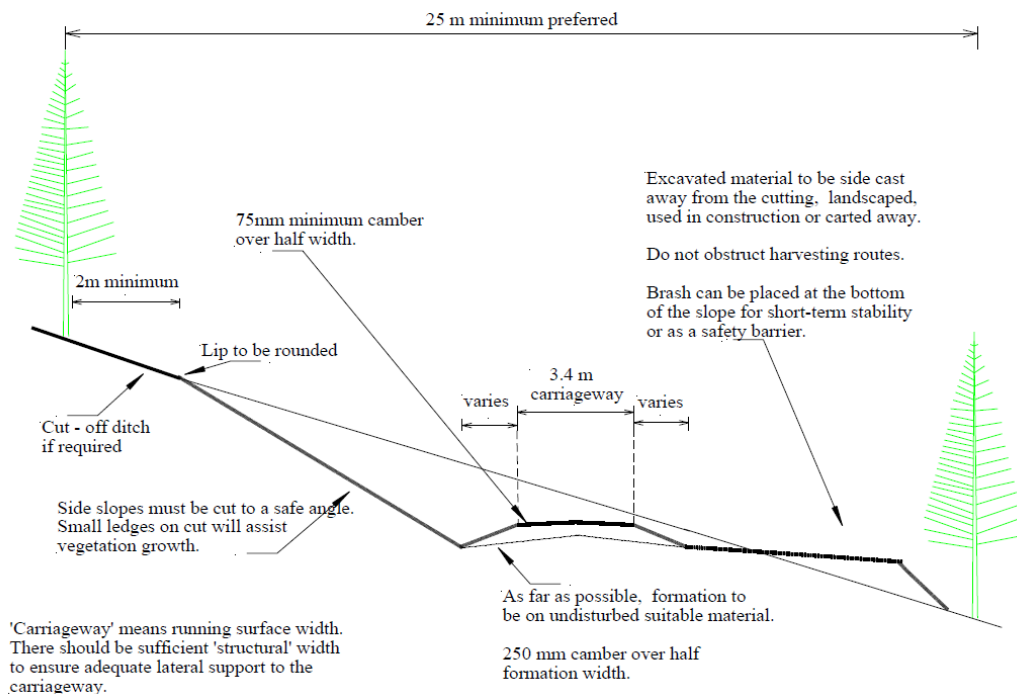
Typical Forest Road Cross Section - Forestry Commission DMRB
